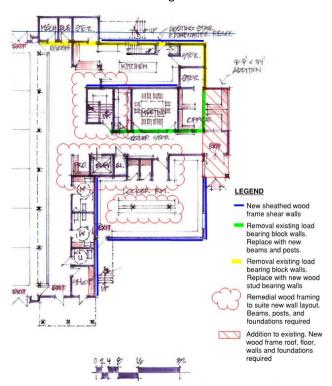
Excerpt from RJC Structural Assessment Report Structural modifications of main floor marked up on Vic Davies drawing.
